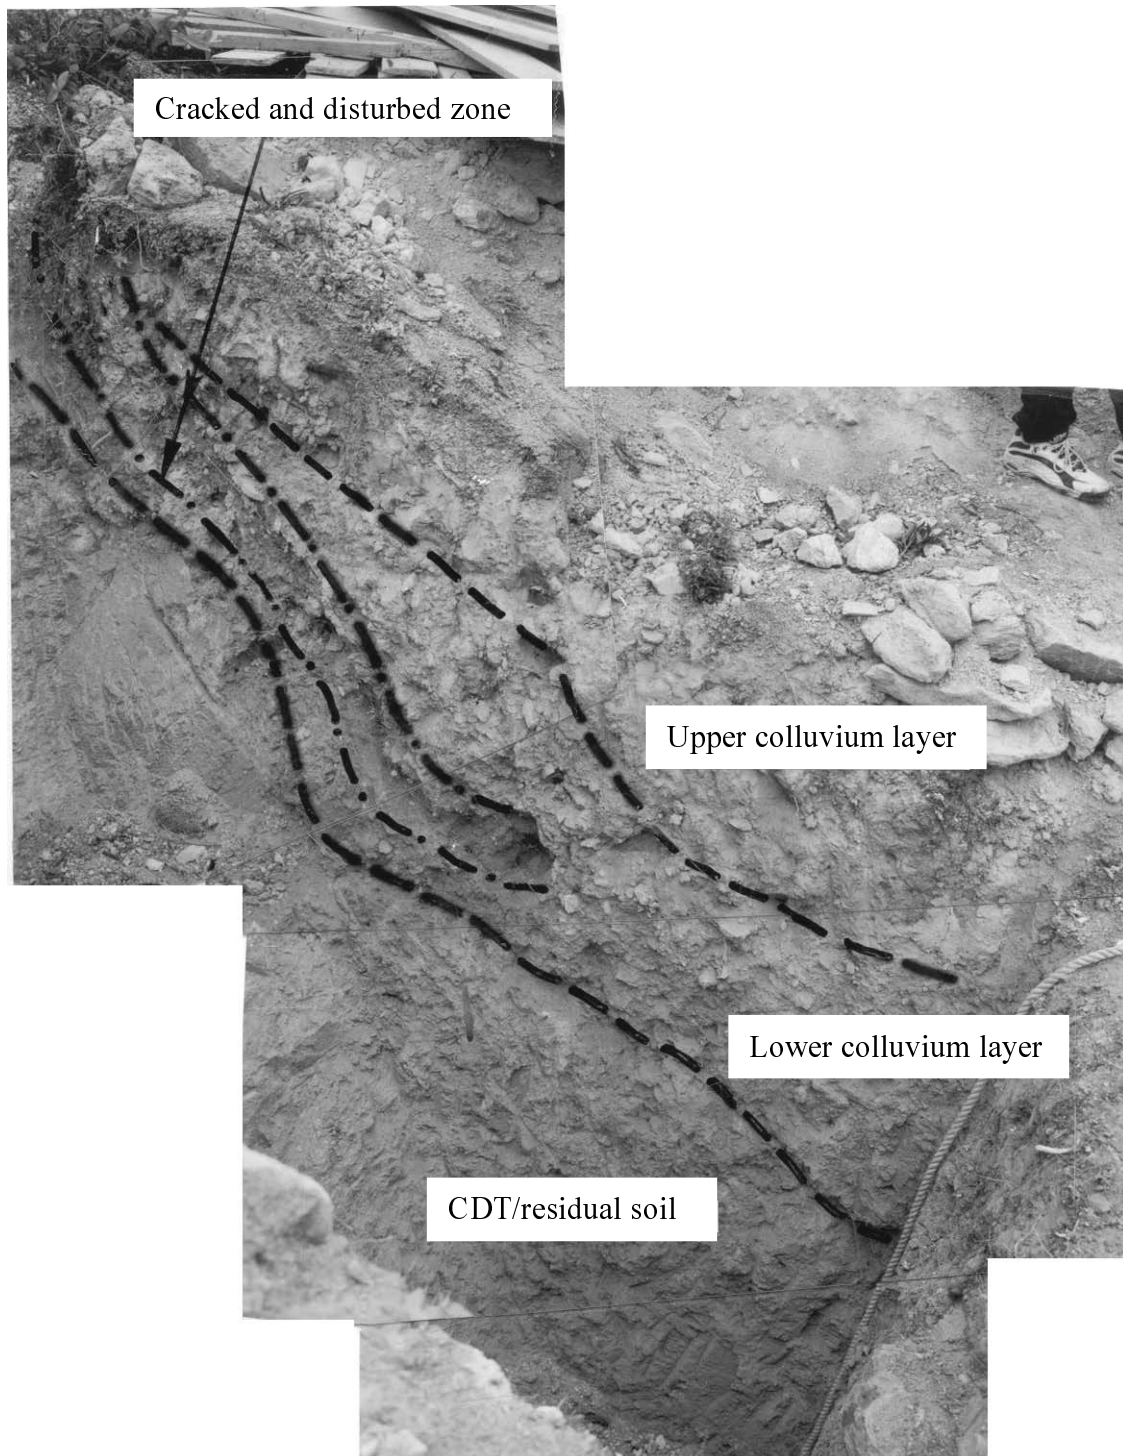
View of Voided Shear Zone Exposed in Face A, Trial Trench TT8
